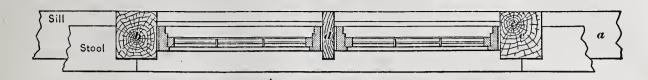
Horizontal Section, Main Window.—Scale, ½ Inch to the Foot.
